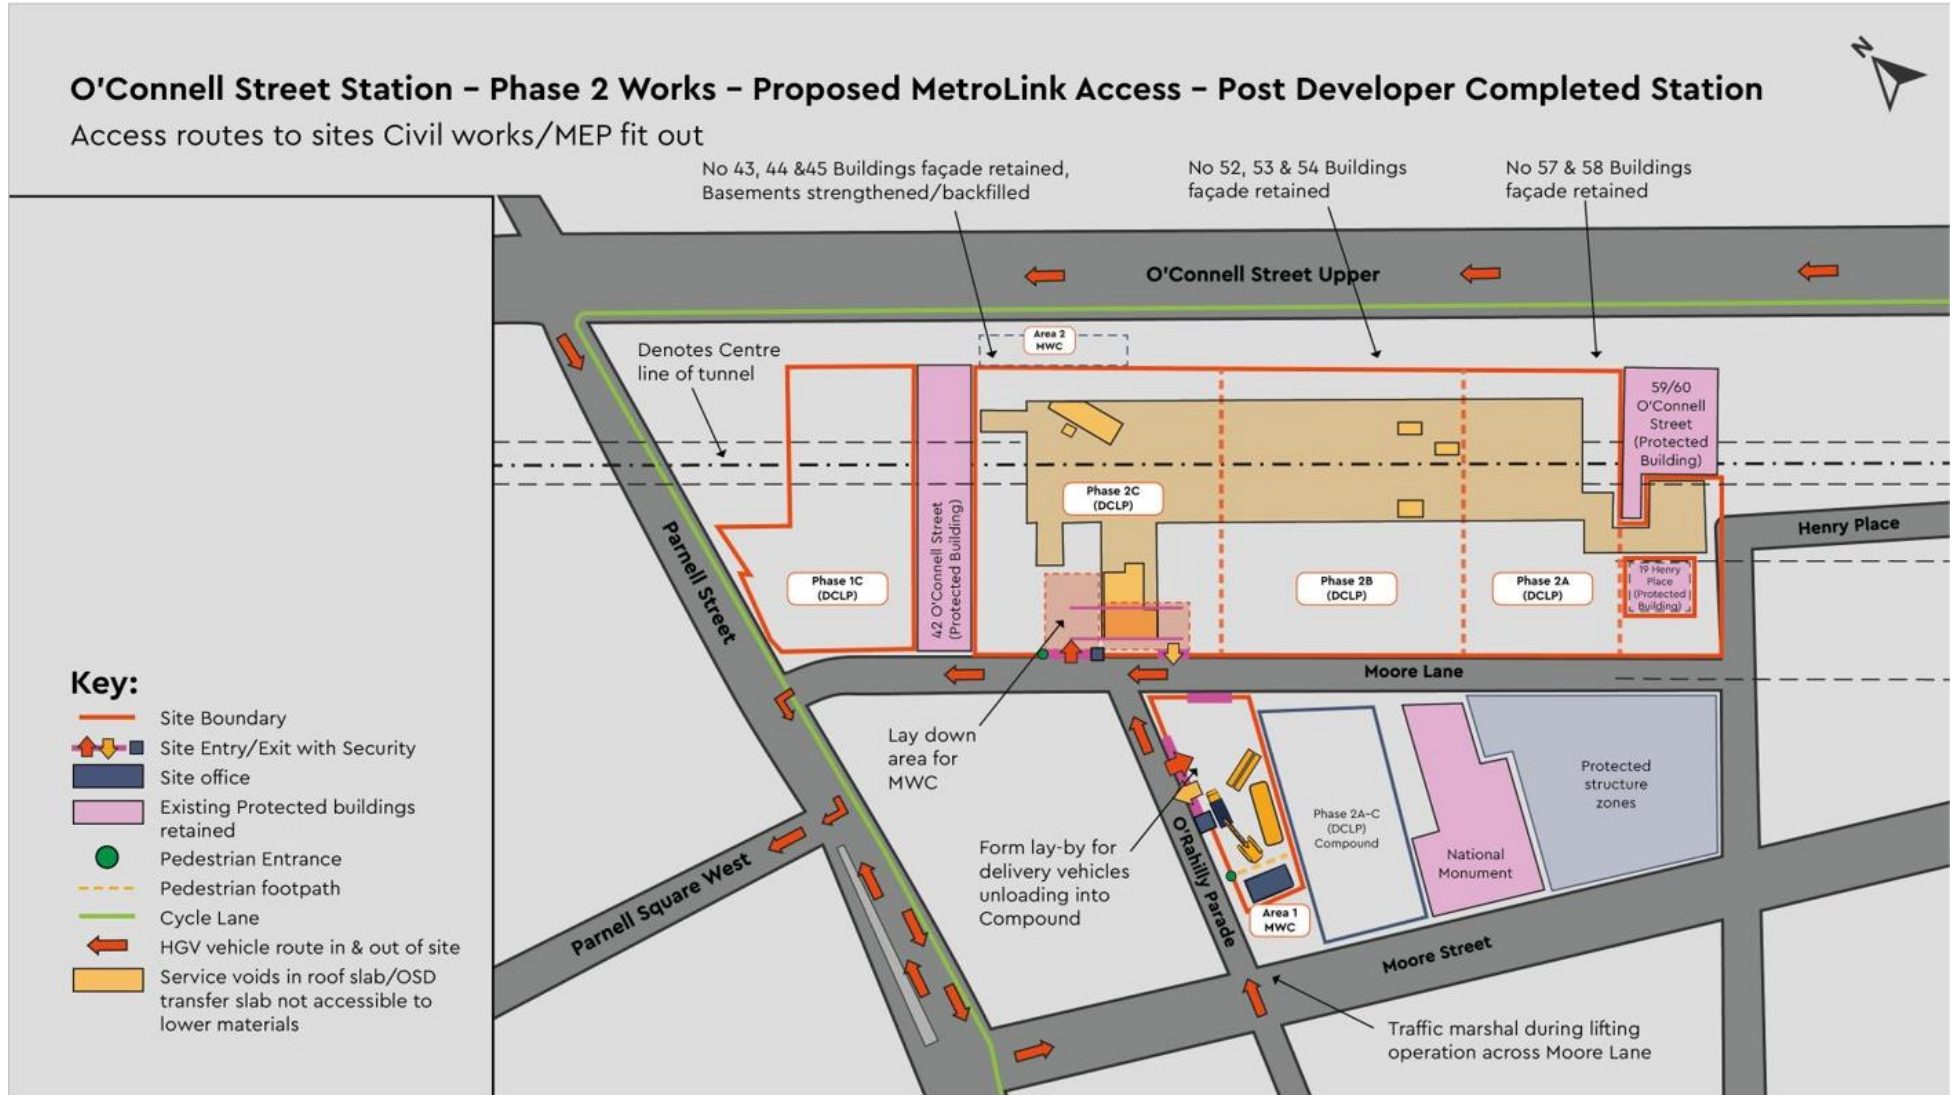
O'Connell Street – Access routes to sites Civil works/MEP fit out
